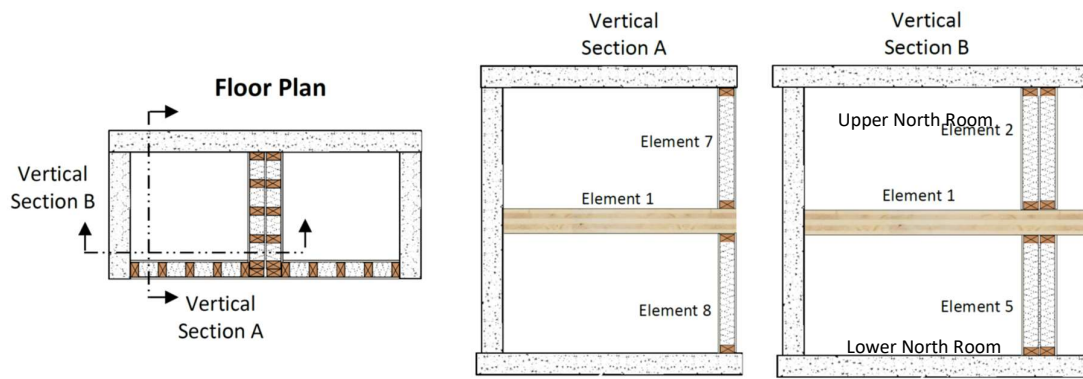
Cross-sections of the construction in the four-room flanking facility. Note that the facility walls are made of concrete.
